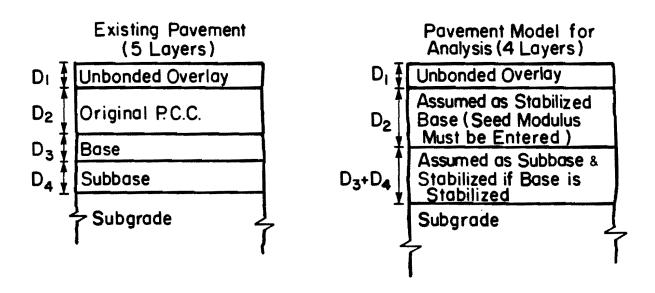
Idealized pavement models for rigid pavements overlaid with concrete layer.
